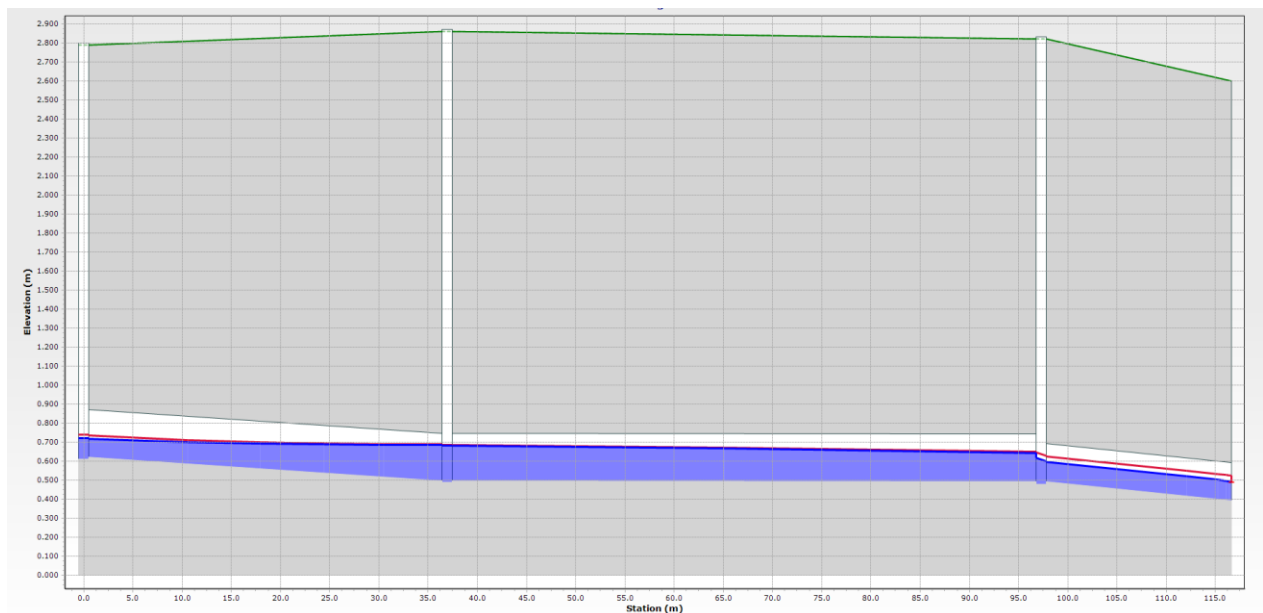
Existing Conditions - Evergreen Rd Deficient Pipe HGL
